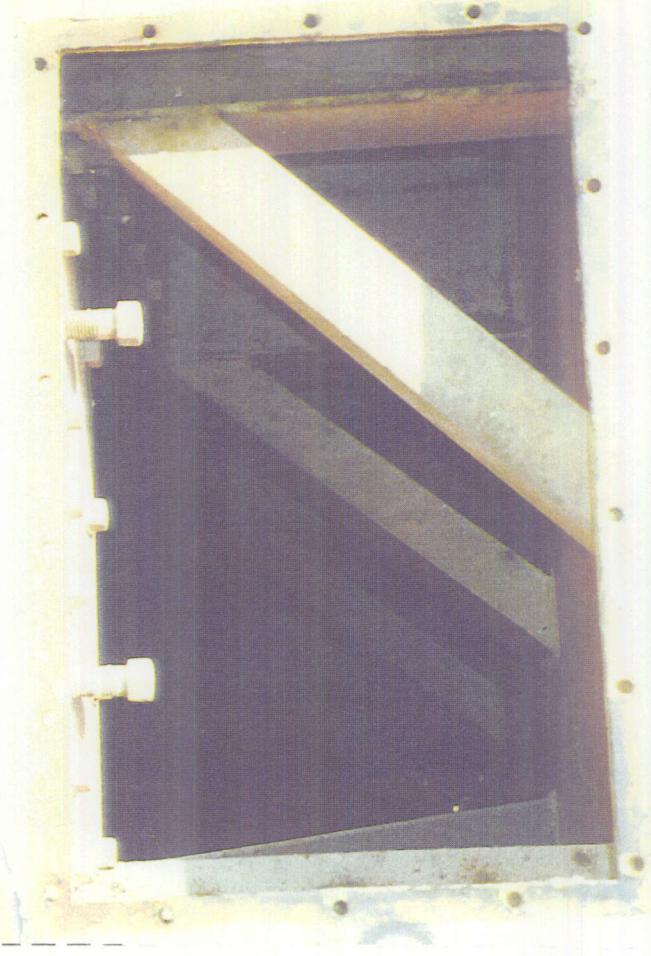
Morris Dam - 70' x 18' Drum Gates - Gate #2, Right side of gate. Bracing for cantilevered portion of upstream faceplate, and portions of horizontal stiffener beams. - Sept 10, 1998.
